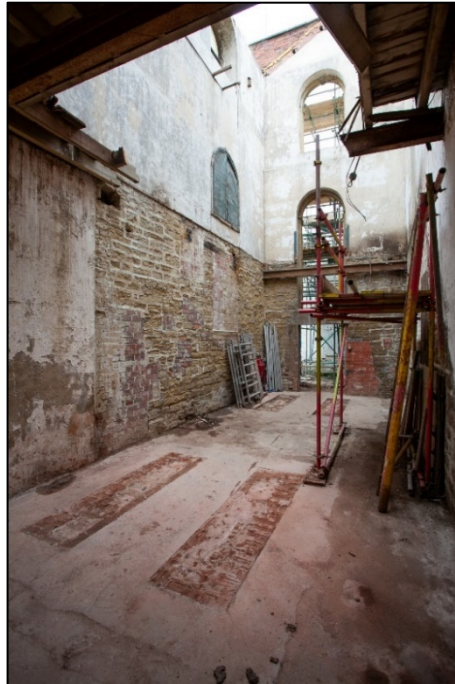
Building 11 following removal of the press, prior to the demolition of its southwest wall and excavation, facing west
